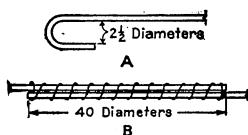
Joining reinforcement; A, Hook; B, Splice
